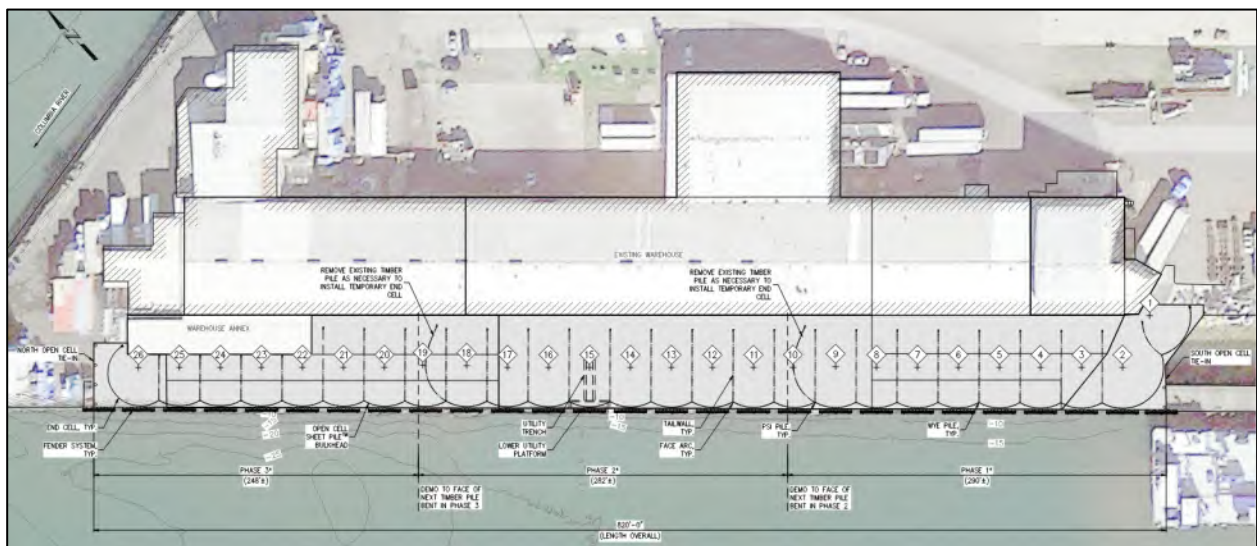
Pier 2 West Plan with OPEN CELL Bulkhead
